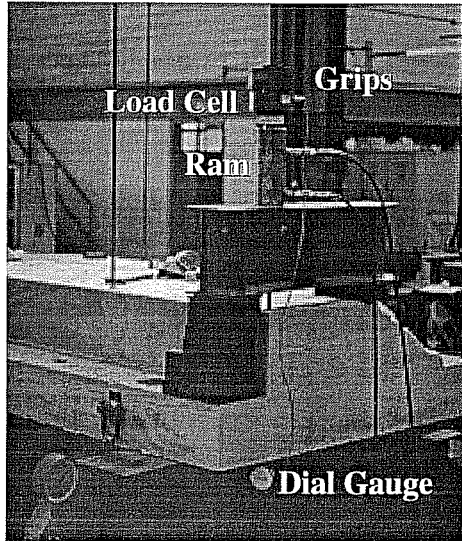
Shallow-Embedment Test Setup and Equipment
